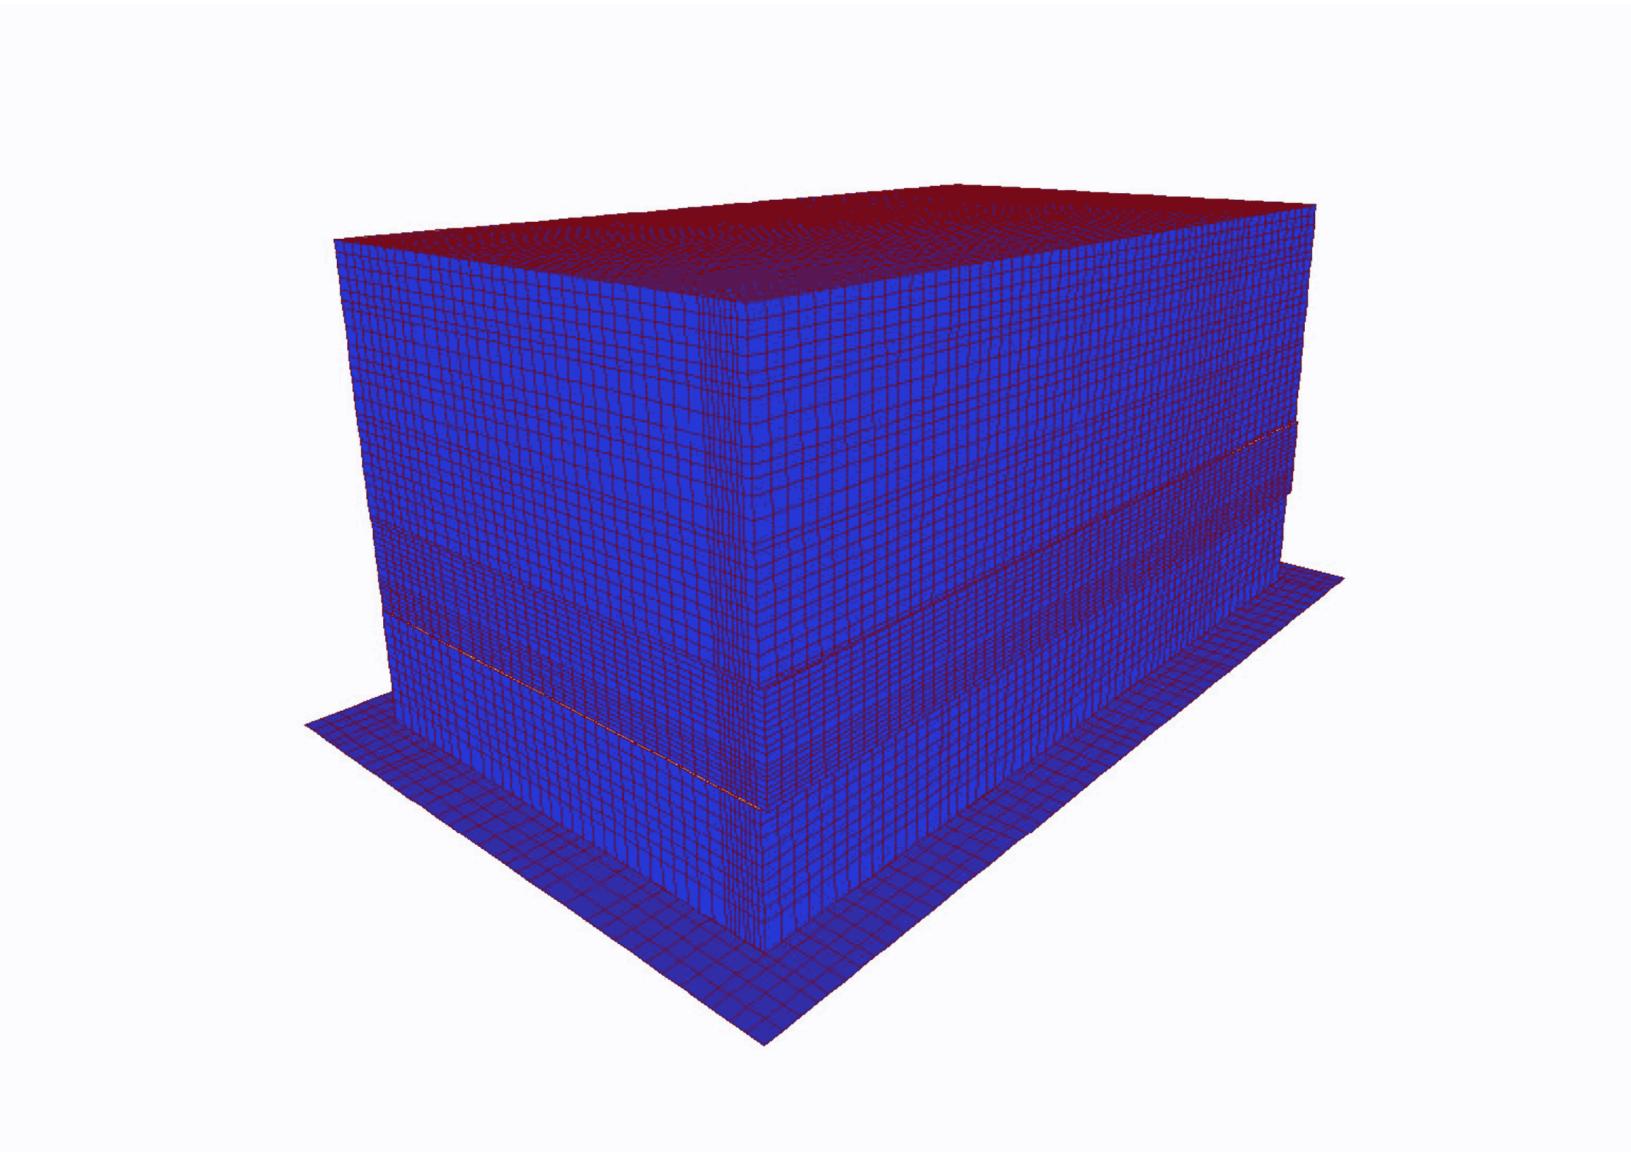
H.3-5 Radwaste Building SAP2000 Model (Looking from Southwest Corner)
